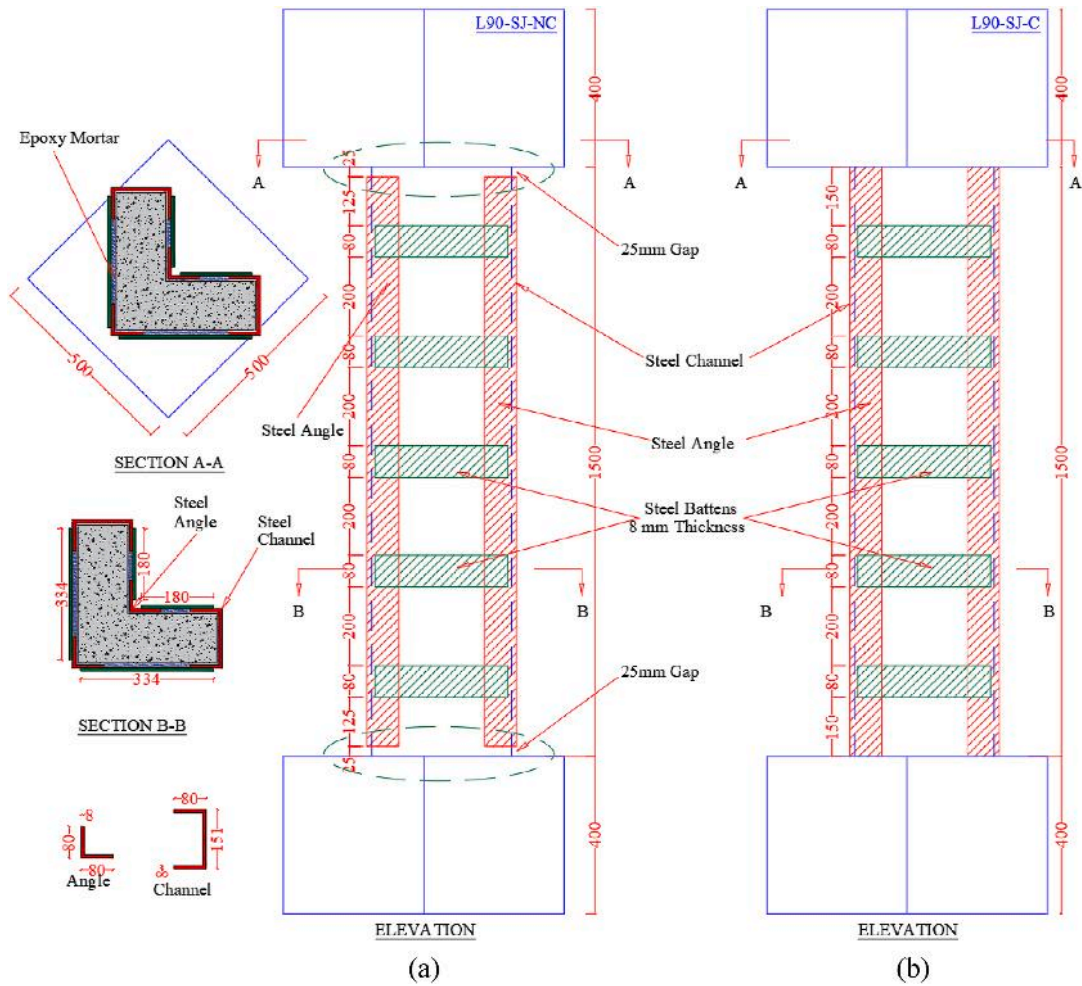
Details of 90° L-shaped steel jacket: (a) Disconnected steel jacket; (b) Connected steel jacket.
